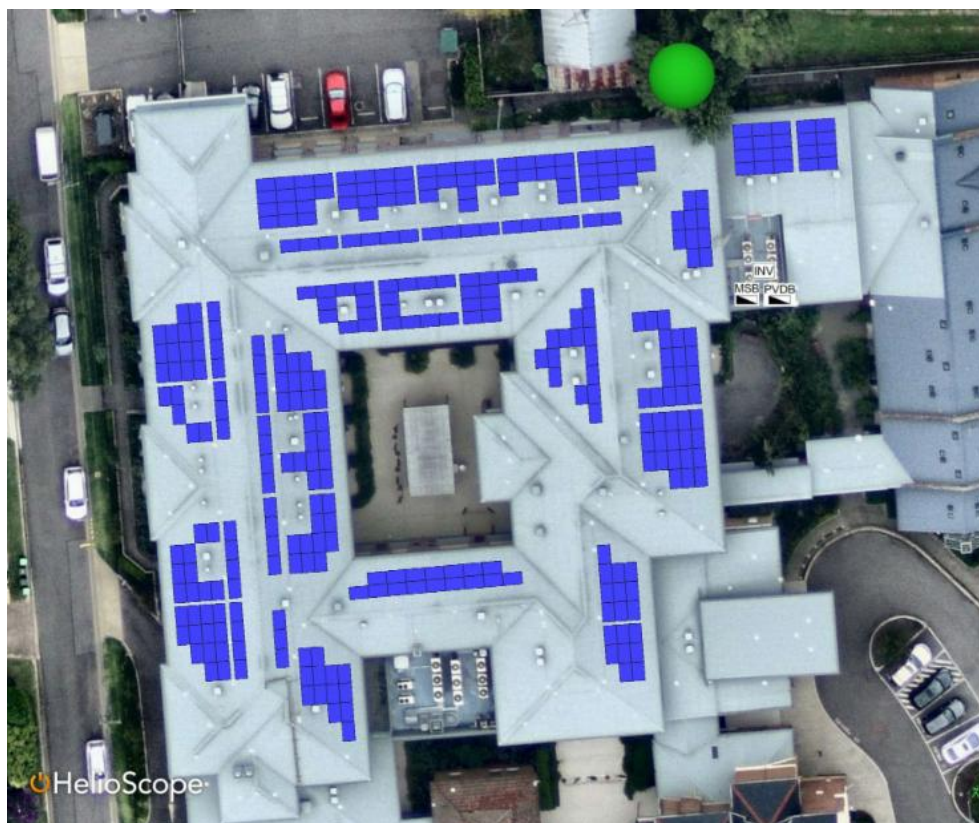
Solar panel array layout plan and installation detail(Source: AGL Energy Solutions, Drawing No. ME-1.0, 16.5.24, Rev.A)
